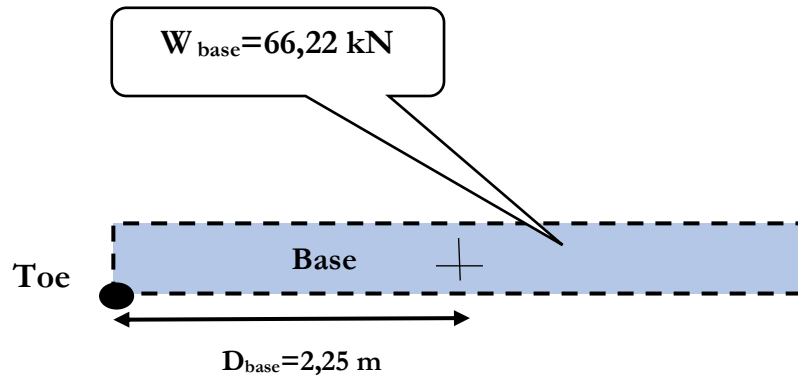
The base weight for the Cantilever Retaining Wall.
